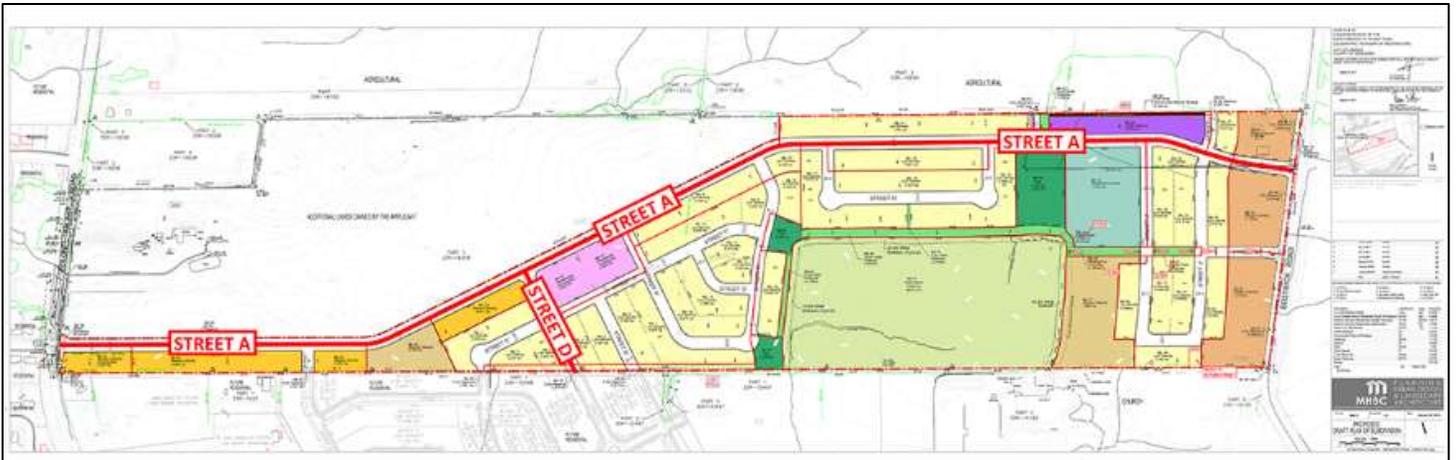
Streets A and D - secondary collector/neighbourhood connector
